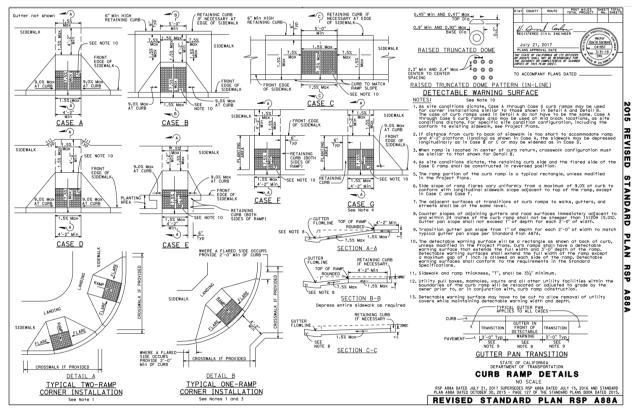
Caltrans Revised Standard Plans for Curb Ramps
